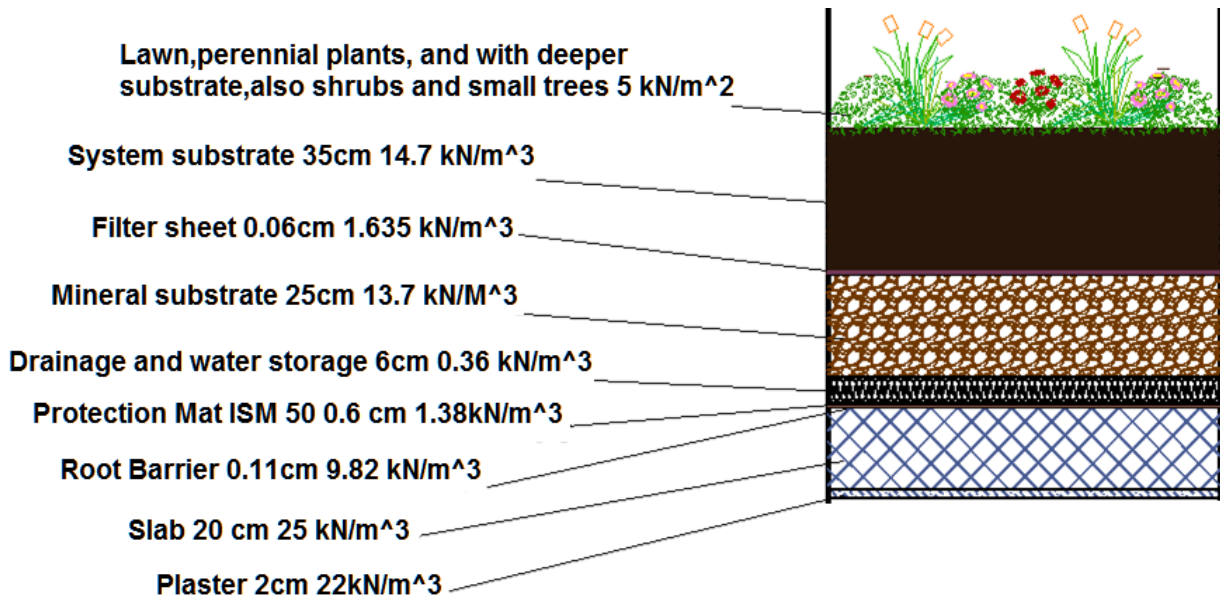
The cross section area for the green roof components of background garden of the building.
